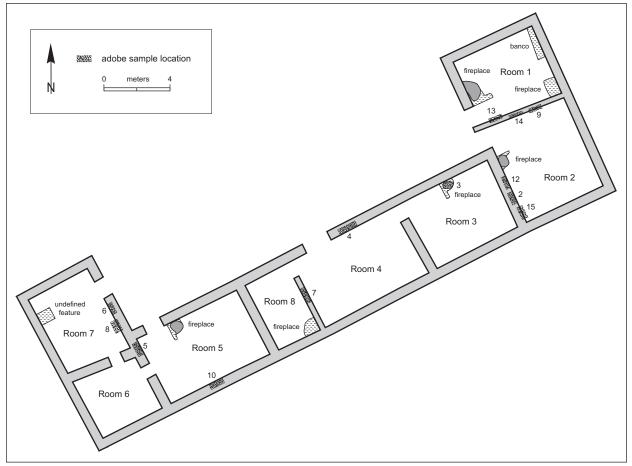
Plan of the Trujillo House showing features and adobe collection locations
